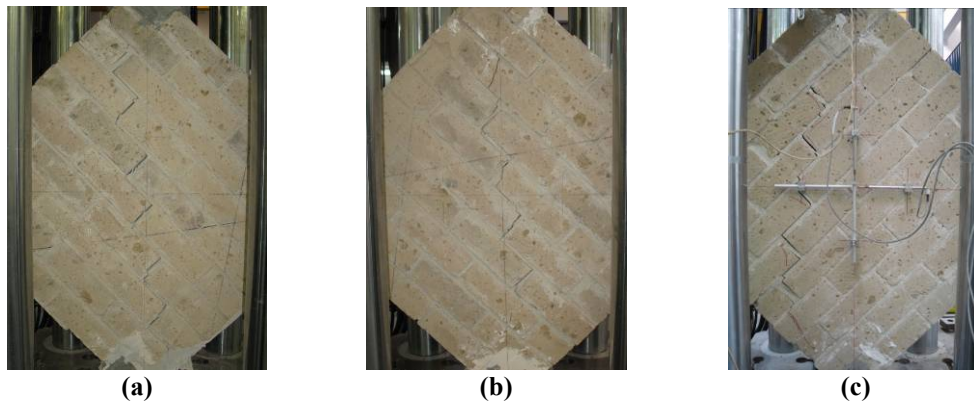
Crack patterns of as-built specimens: (a) P1; (b) P2; (c) P3.
